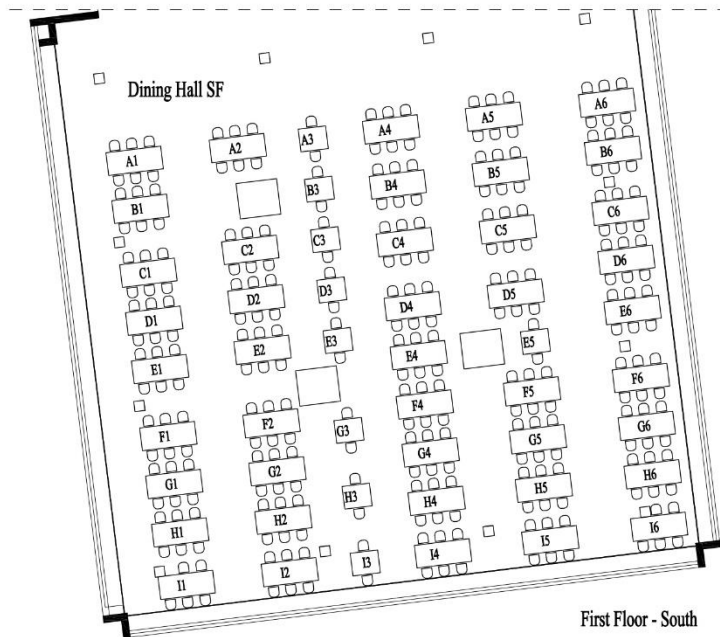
First Floor Plan and Temperature Data Notation of South Dining Hall
